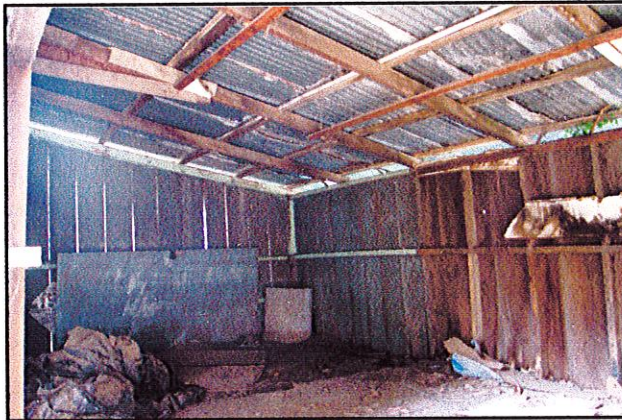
Utility building, built ca. 1925–1930. This view of the interior is facing northwest. Note the corrugated metal roof material. Photograph date, November 5, 2002.
